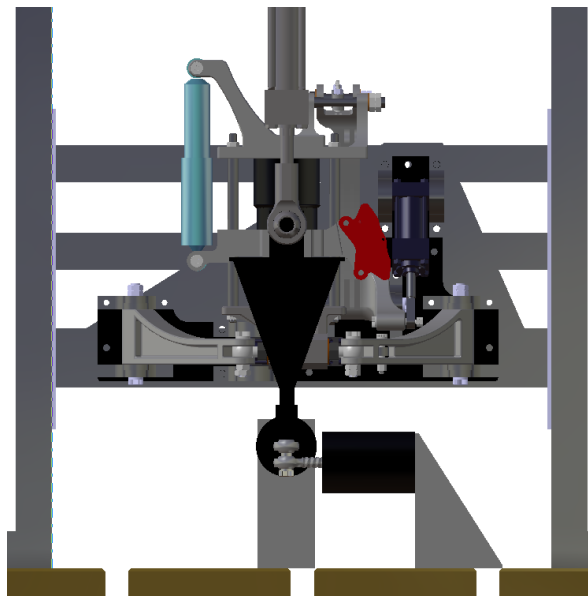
Front view of the corner module on the test setup with actuators to exert loads on the assembly.
